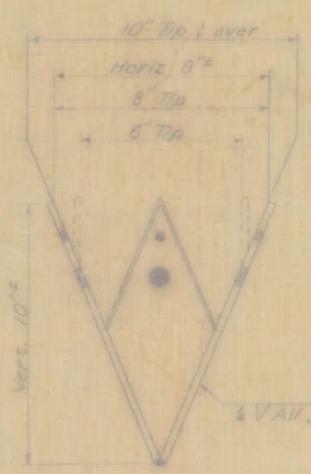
DETAILS OF VERTICAL EXPANSION JOINTS (C)
